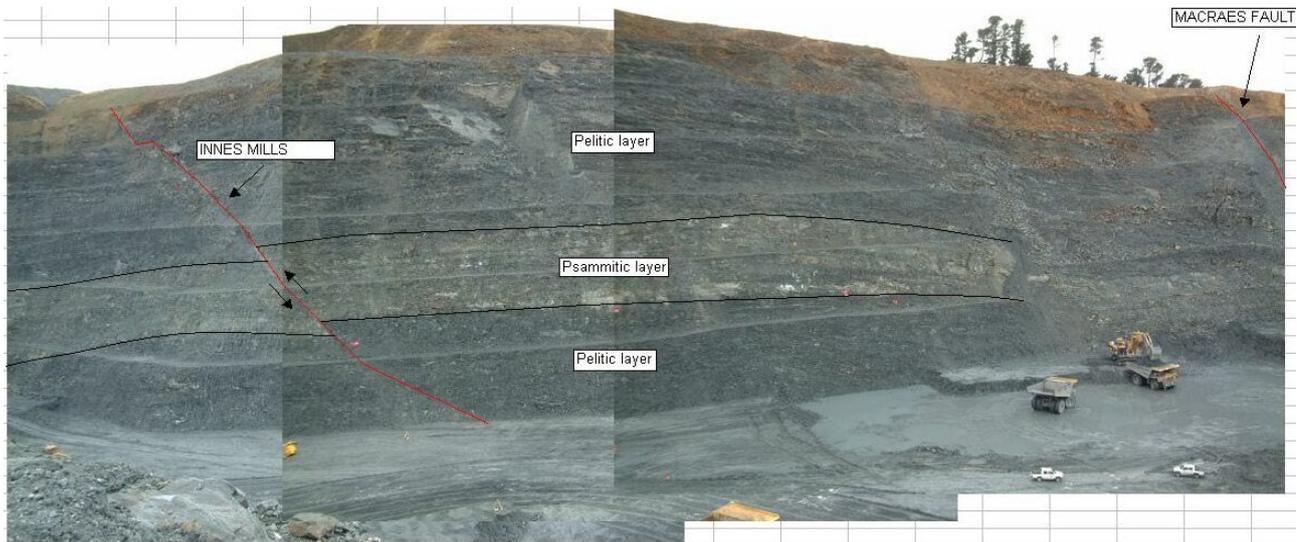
Slope performance of Innes Mills Stage 4 east wall, 2002. Multiple multi-bench failures have occurred.
